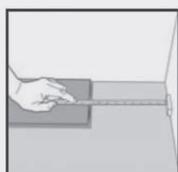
First plank, first row. Place a spacer of 15mm thickness to the left and position the plank against the wall. Later, after 3 rows, you can easily position the flooring against the front wall with distances  $\approx$  15mm.
